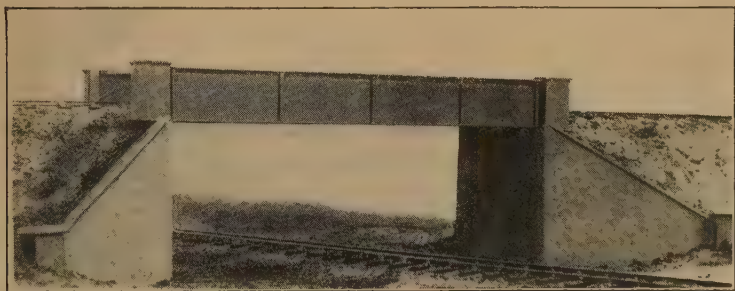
Overline Bridge (L.N.W.R. Pattern)
